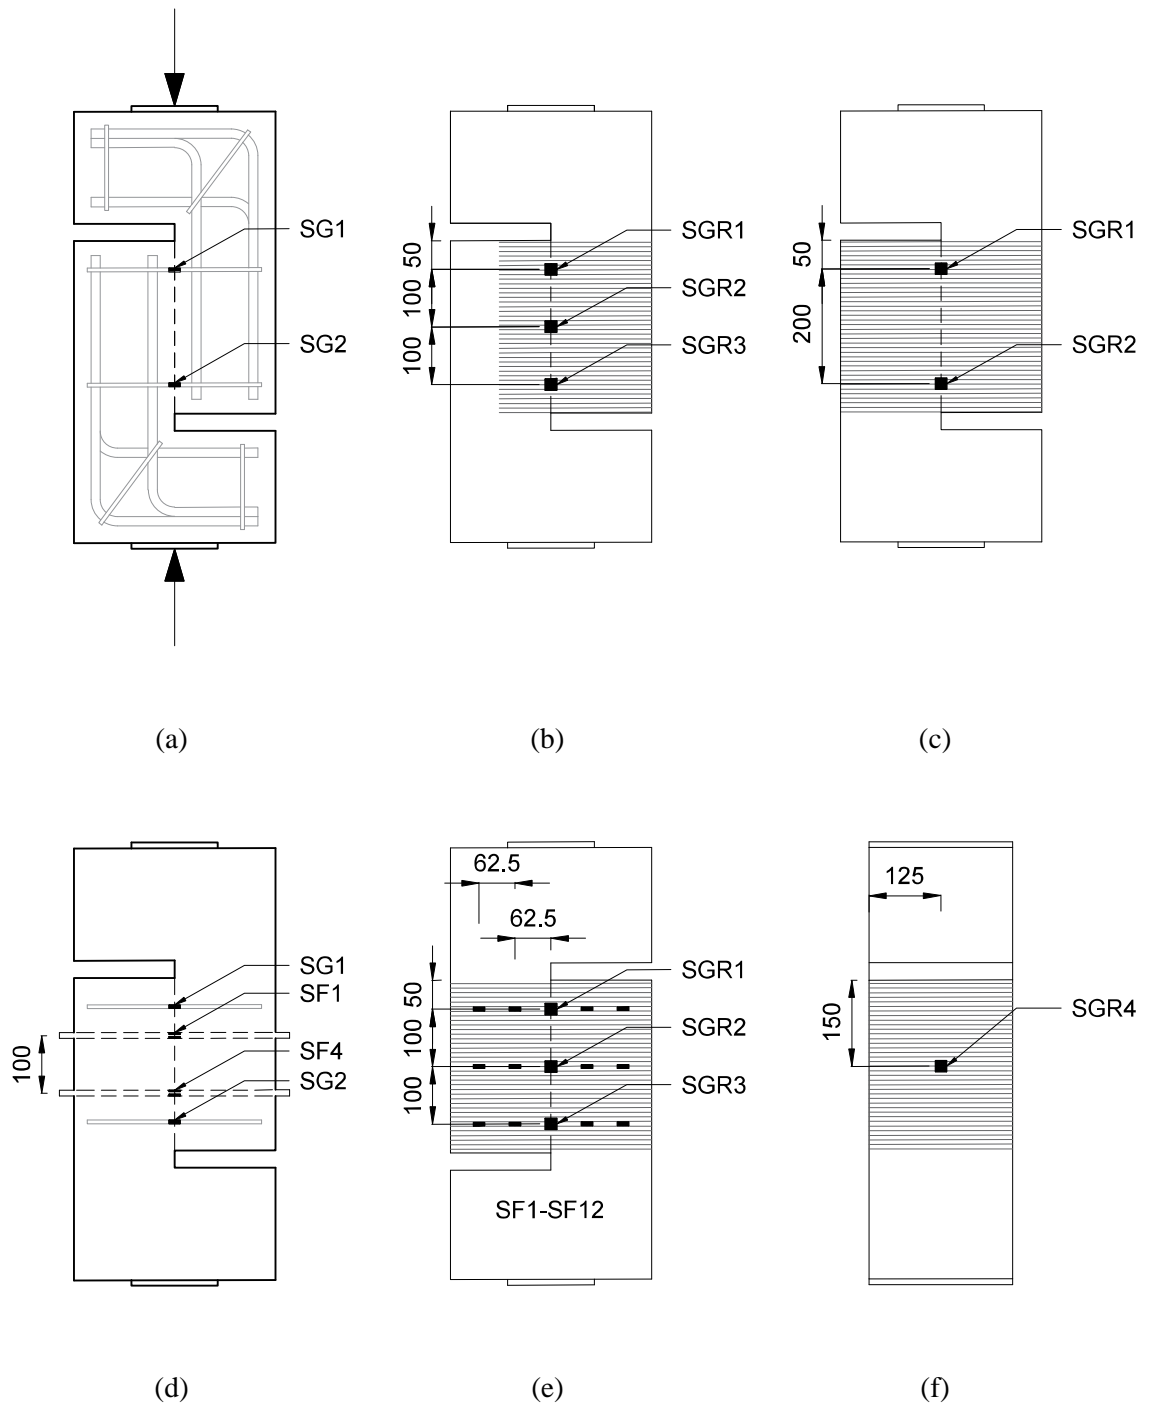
Push-off specimen instrumentation: (a) unstrengthened control specimen C2 – long section, (b) specimens strengthened with CFRP sheets in a U-wrap configuration – front view, (c) specimens strengthened with CFRP sheets in a fully wrapped configuration – front view, (d) deep embedment specimen – long section, (e) pre-cracked specimen strengthened with CFRP sheets in a fully wrapped configuration – rear view and (f) side view [mm].
